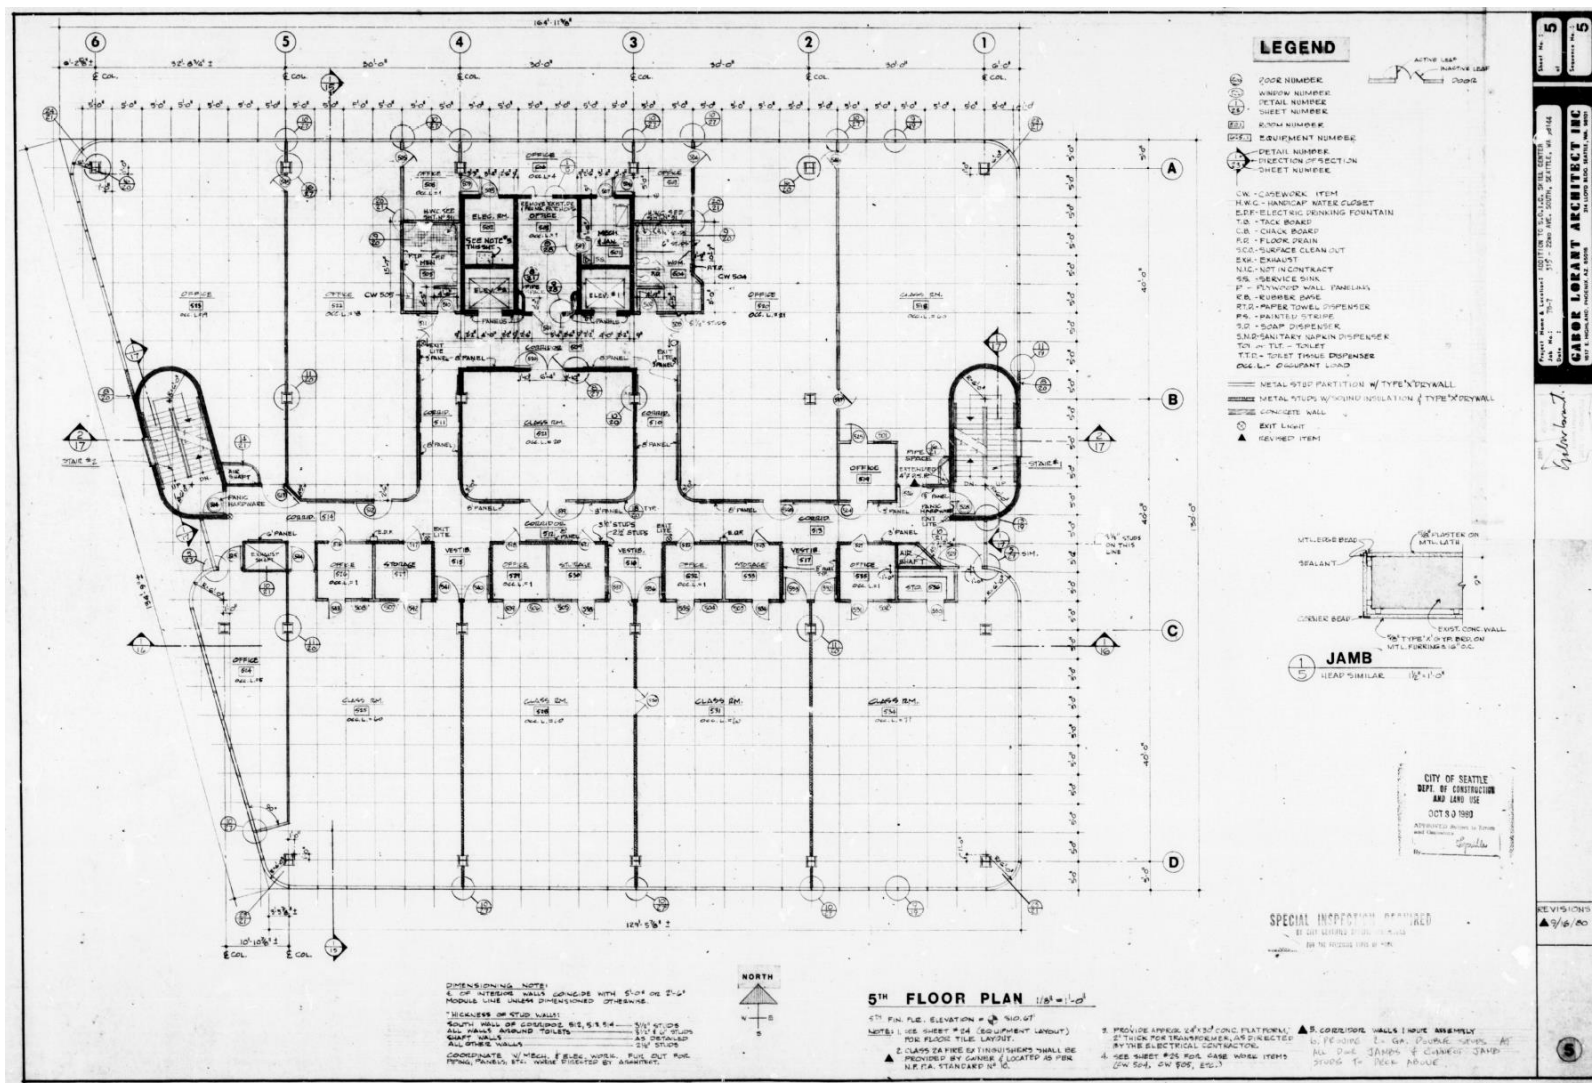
Fifth Floor Plan by Gabor Lorant, 1980
